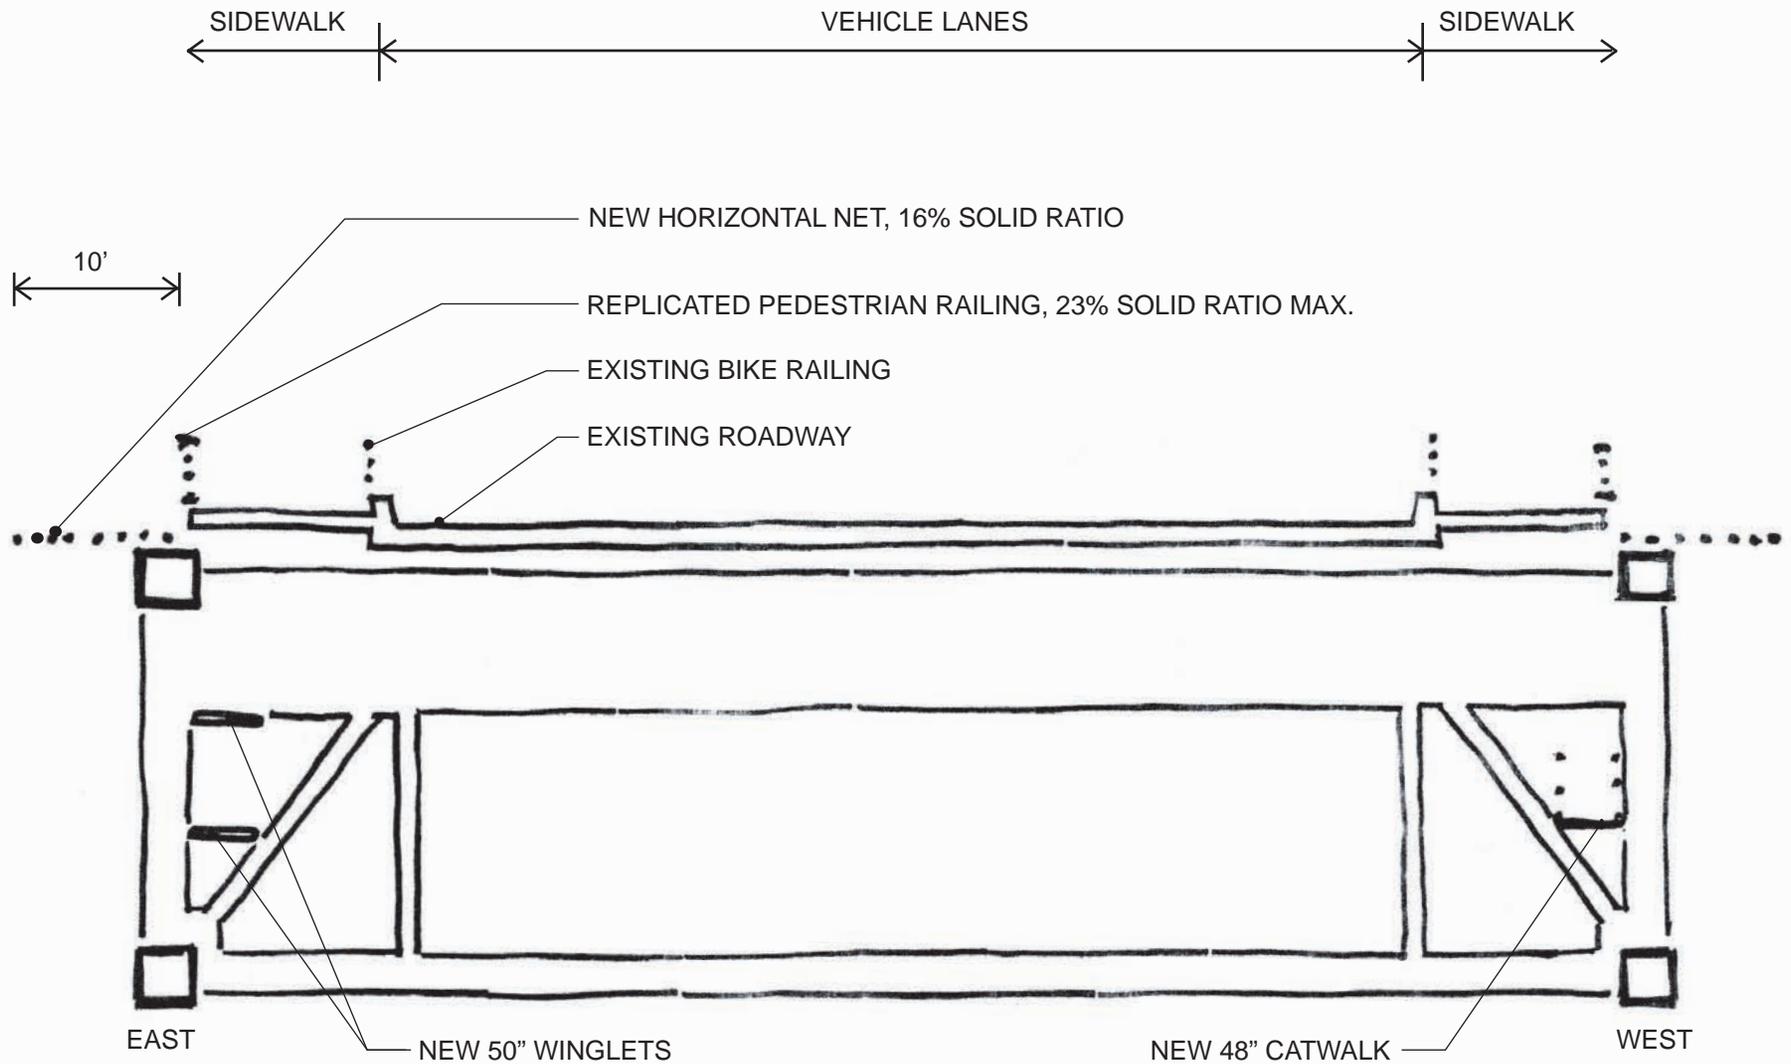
CONCEPT 3 : UTILIZING NETS THAT CANTILEVER OUT HORIZONTALLY W/ REPLICATED PEDESTRIAN RAILING
